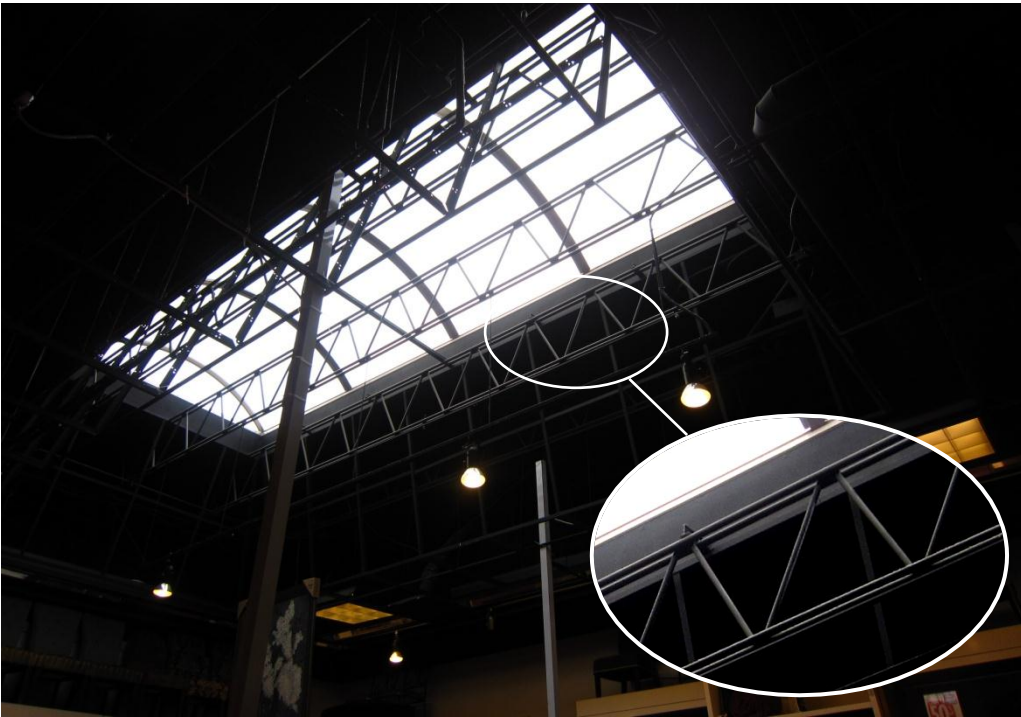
Open web steel joist consisting of rods for web and chord members (Building 5).
